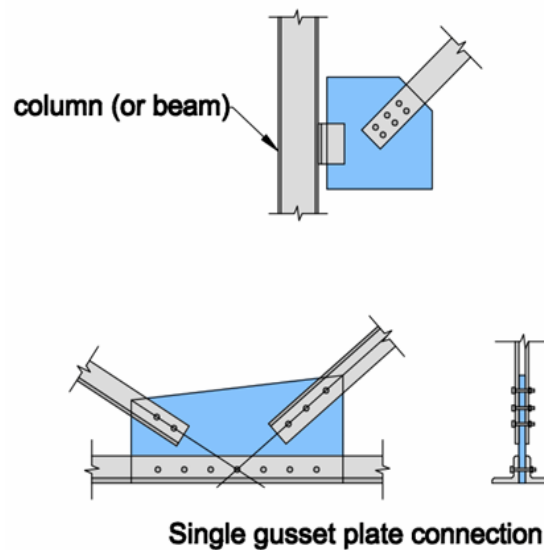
Schematic Showing Configuration of Two Typical Gusset Plates
